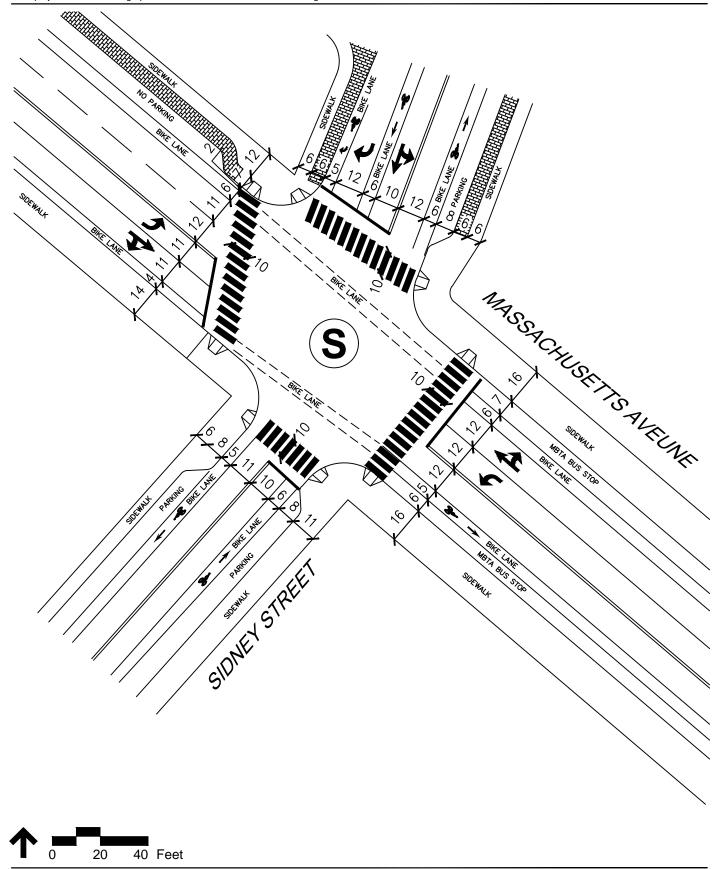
b.4 Existing Conditions Intersection Sketch Massachusetts Avenue at Sidney Street Mass + Main
